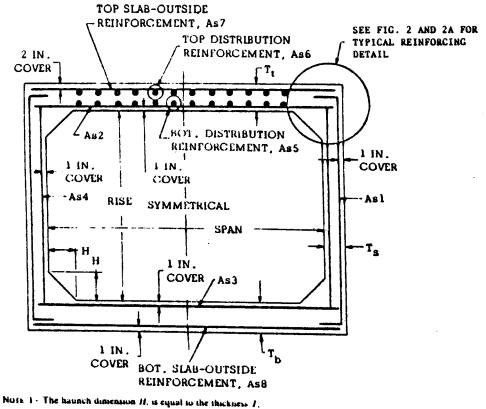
shows the reinforcement detail and cross section geometry for a C 850 box section. Figure 2 shows the assumed simplified wheel loading specified for the so-called "strip" design method.
